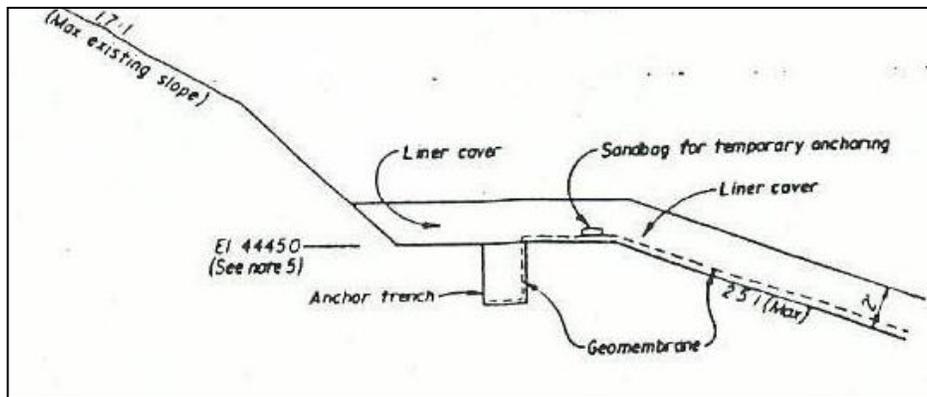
Proposed anchor trench detail used at Black Lake Dam.
